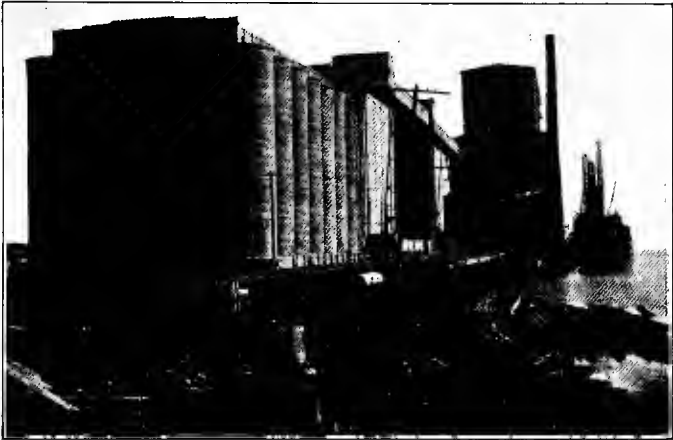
An elevator and concrete storage bins at Baltimore, Md.
